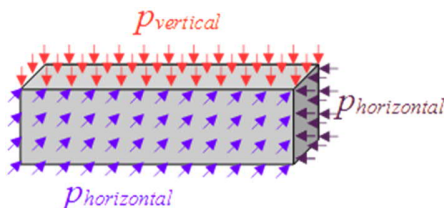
Application of pressure loading ‘across the corner’ for box-shaped building, DIN 25449 (2022)
